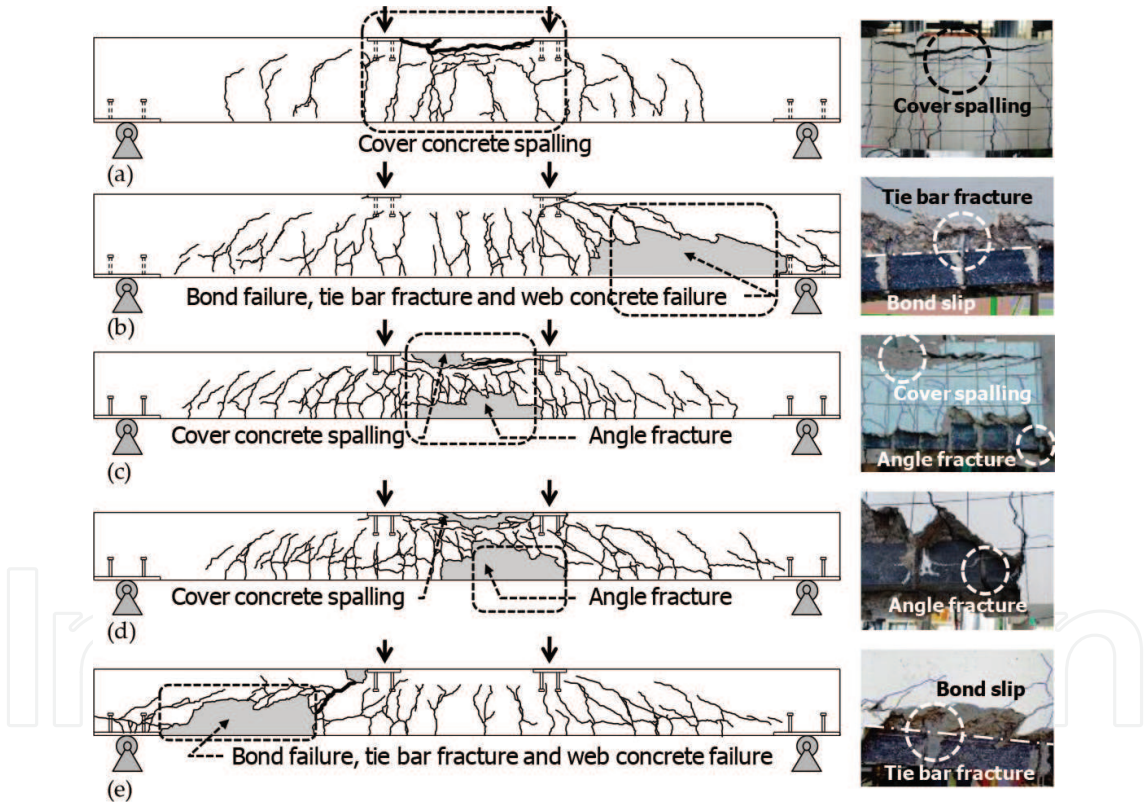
Failure modes of CES and PSRC columns. (a) CES column, (b) PSRC column, (c) PSRC column @ 100 mm tie, (d) PSRC column @ 200 mm tie, (e) PSRC column @ 300 mm tie
